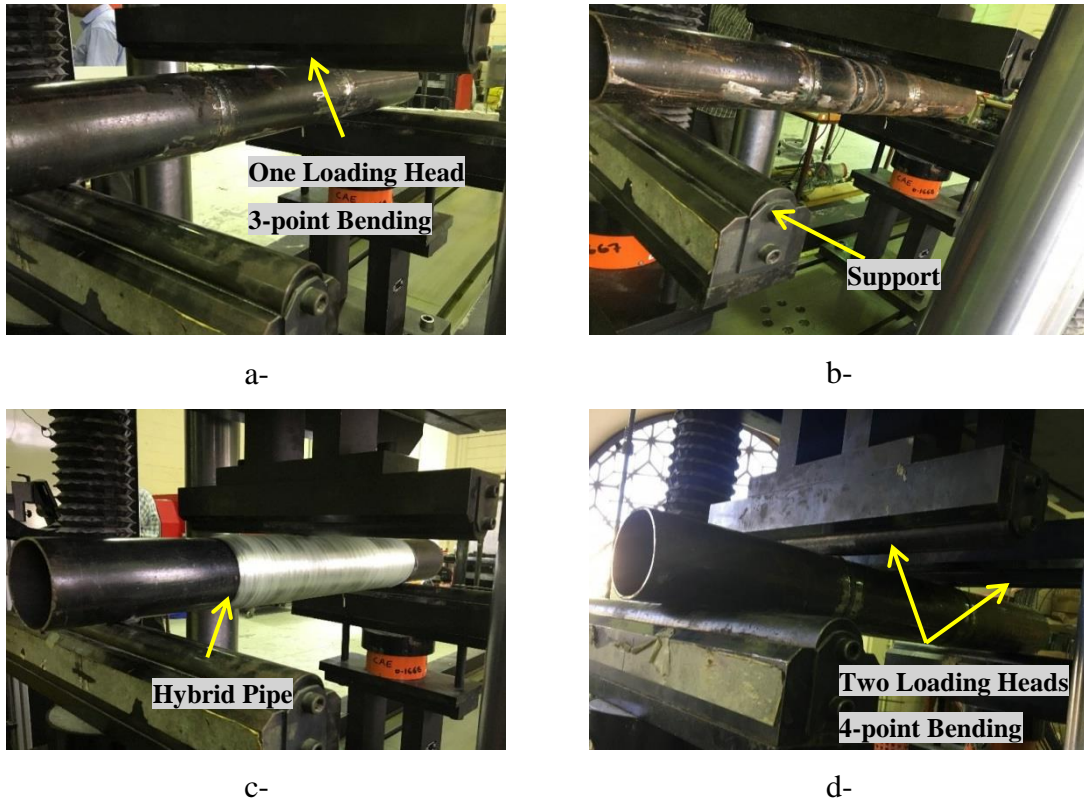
3-point bending for; a- steel pipe with two welding lines, b- 4 welding line c- steel-composite pipe, and d- 4-point bending for a steel pipe with two welding lines.
